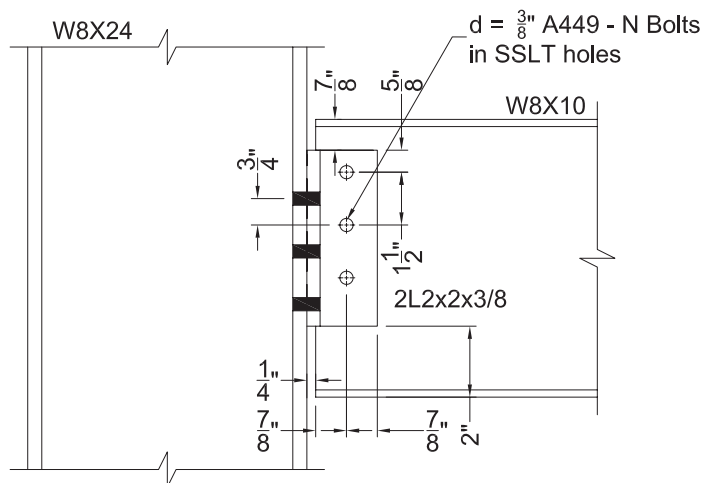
Half-scale Girder-to-Column Double-Angle Connection
